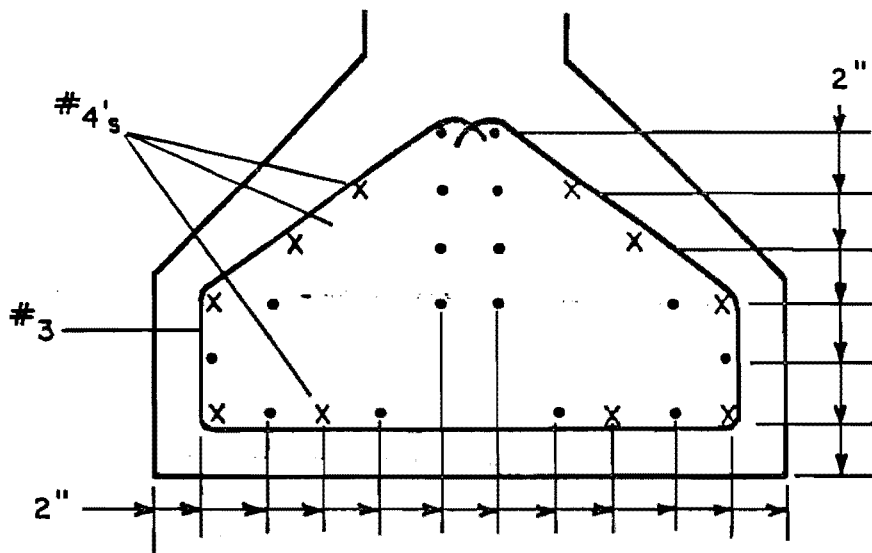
Specimens C-16-CP-7.2-NO-2.54 and C-16-CP-5.5-OL-9.43 passive and confining reinforcement layout
